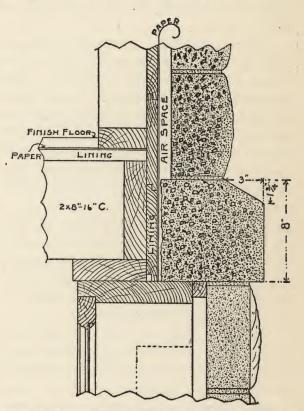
Section showing the details of construction at the level of the water table, or first floor level.
